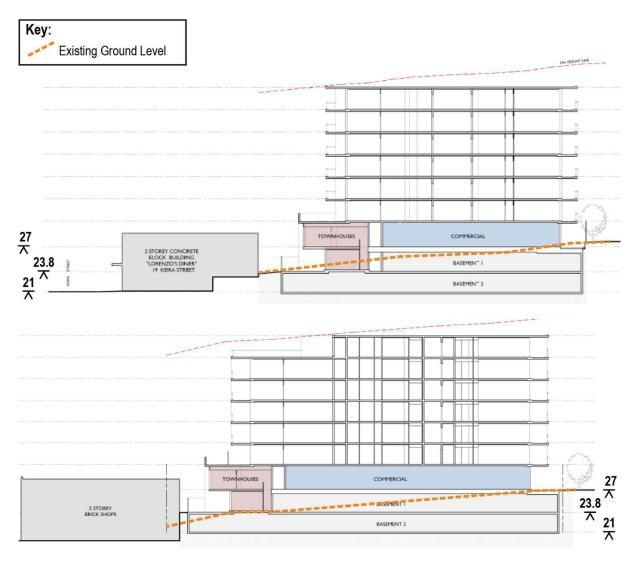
Proposed south-facing sections through northern (top) and southern (bottom) halves of the site. (Source: Knight Frank Town Planning with GML overlay, 2016)
